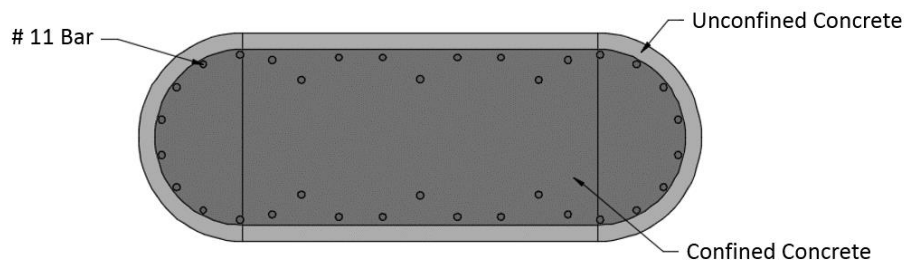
Salmon River Bridge Cross-section of a CIP Column with Reinforcing
